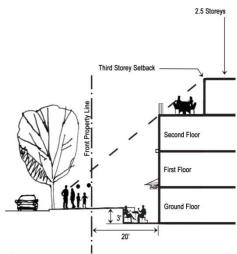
Illustration of upper floor setback for flat or shallow pitched roofs
